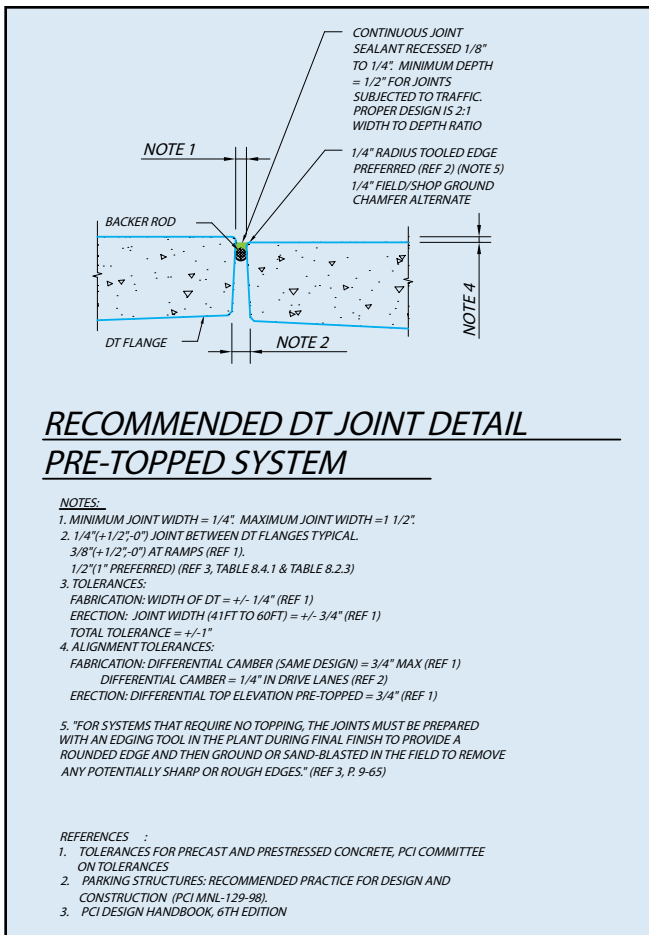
Recommended double-tee joint detail pre-topped system. Note: " = in.; 1 in. = 25.4 mm.
